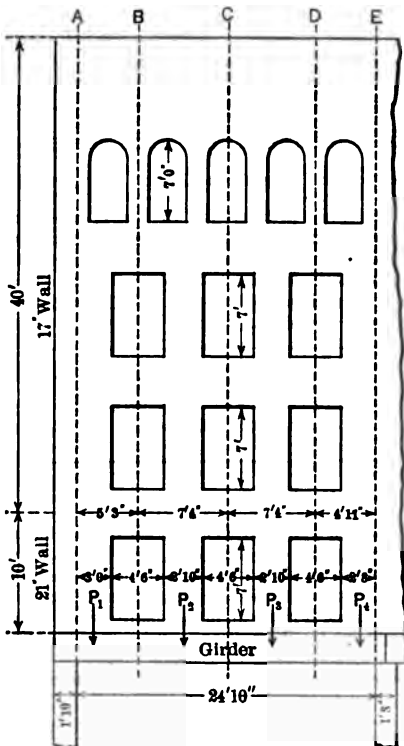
Box Girder Supporting Brick Wall. Example 2
